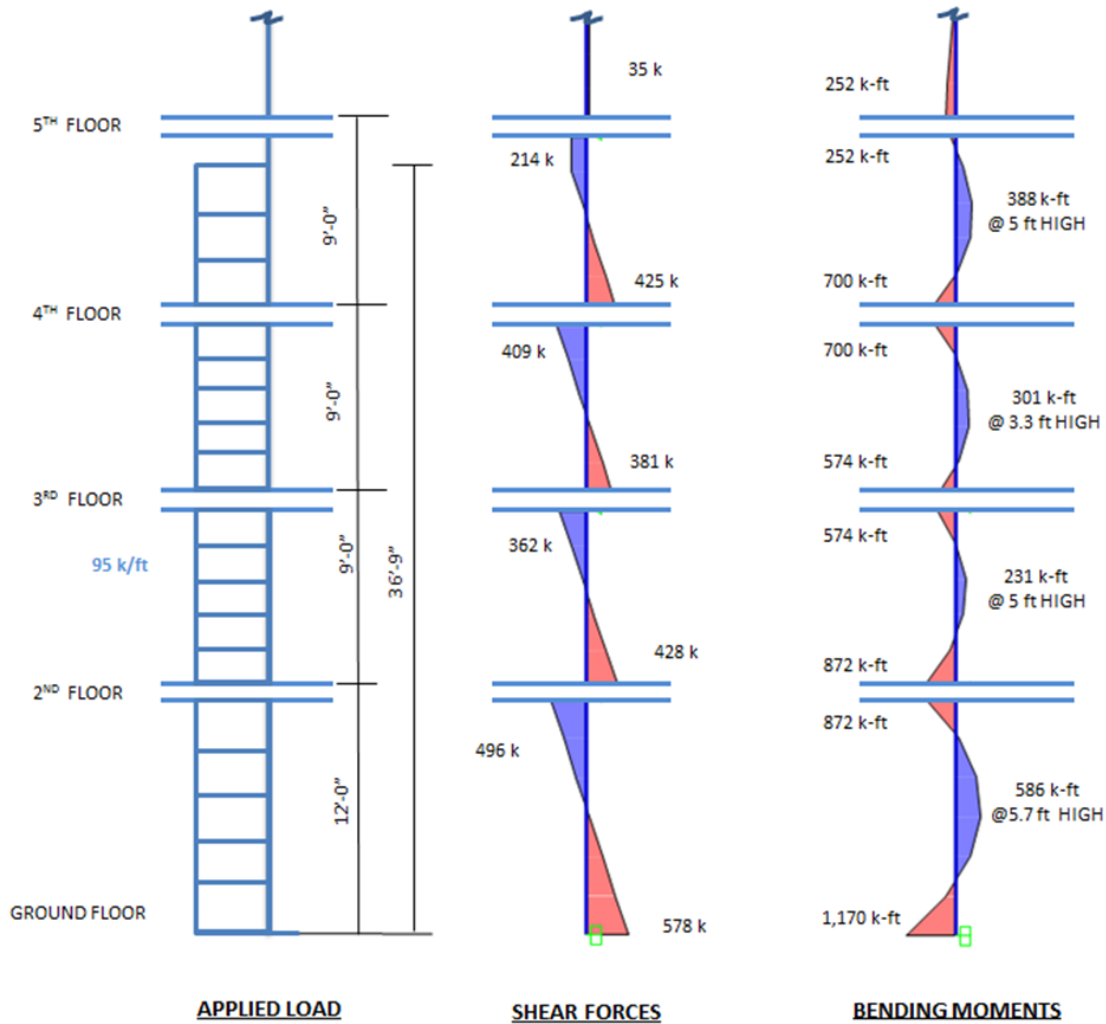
Hydrodynamic loading on exterior column of Hilo residential building due to Load Case 2
